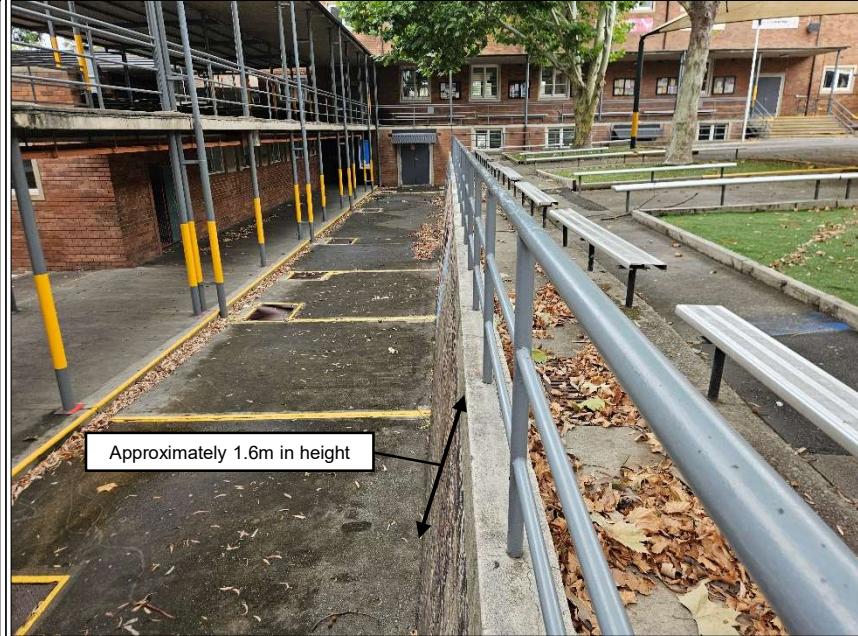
CAR PARK AND OPEN SPACE IN THE WEST OF SITE FACING NORTH-WEST
